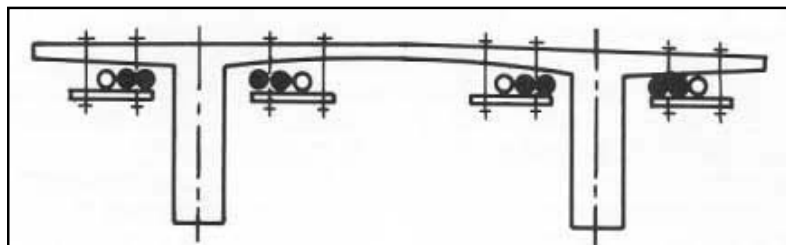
Cross-section of Roquemaure Bridge with added external tendons
